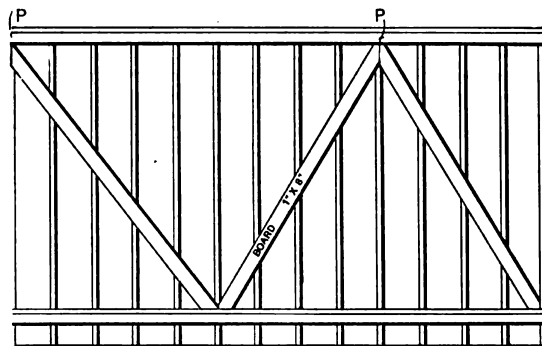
Under View of Section of Roof S T of Fig. 64, Showing Method of Bracing.
